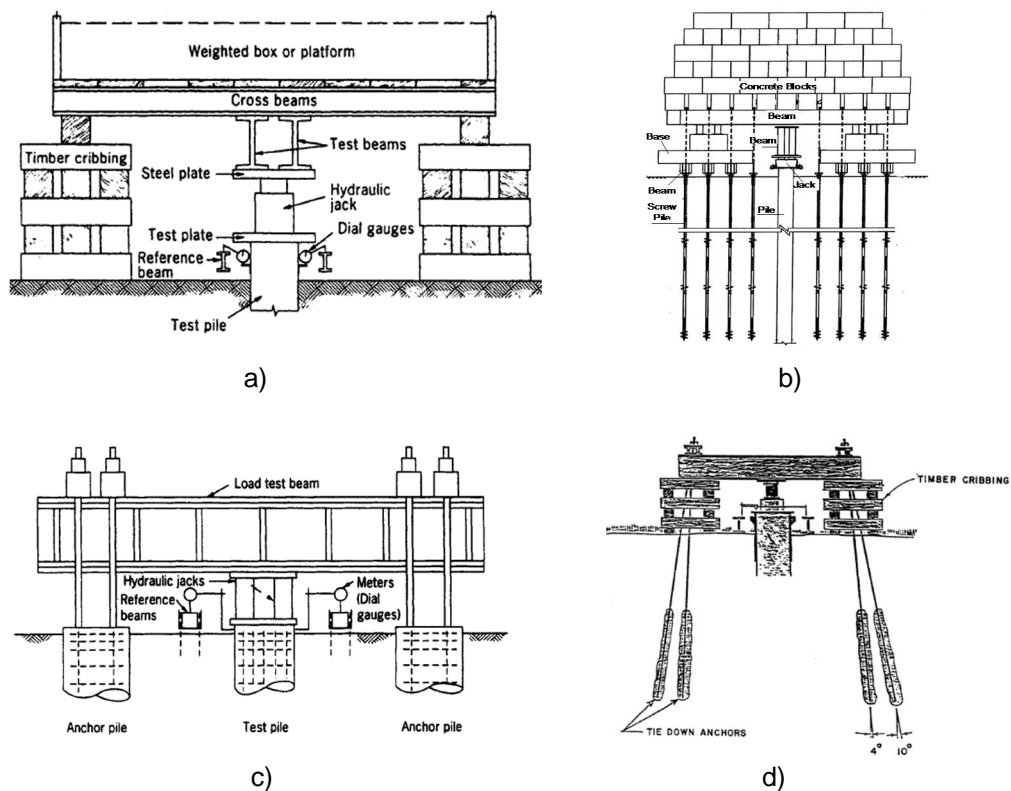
Types of the reaction load arrangements for the modern static pile load tests: a) Kentledge system, b) Kentledge combined with anchored piles, c) System of anchored piles and d) System of tie-down anchors (Prakash and Sharma, 1990)
